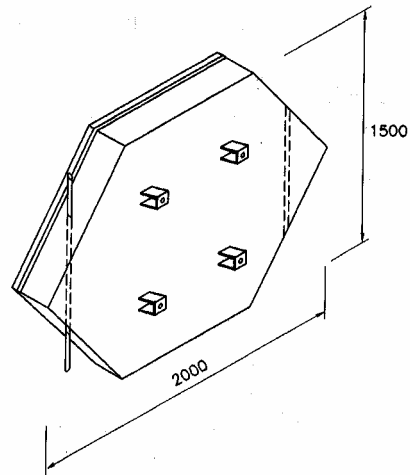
Hexagonal Shaped Facing Panel of AE Wall
